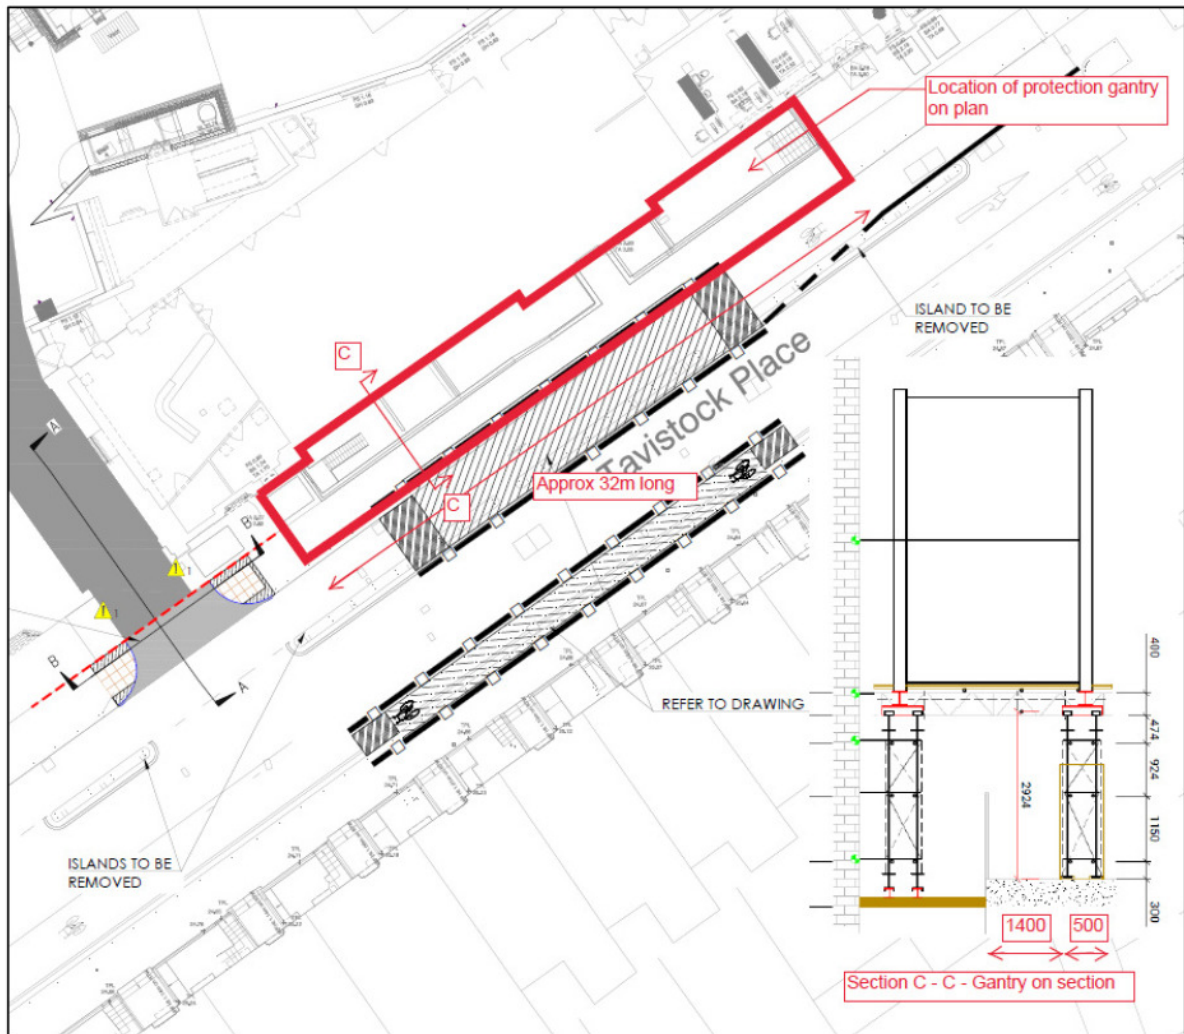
Plan & Section showing welfare accommodation above footpath to Tavistock Place.
